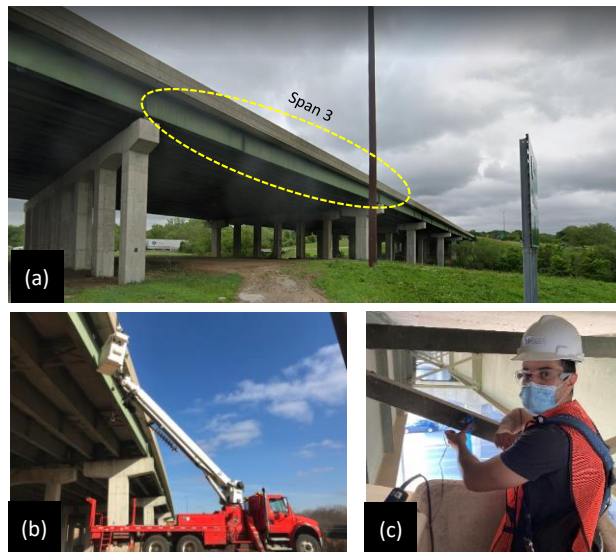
a) The steel highway bridge testbed; (b) a man-lift truck to access the bridge girders; (c) installation of strain gauge
